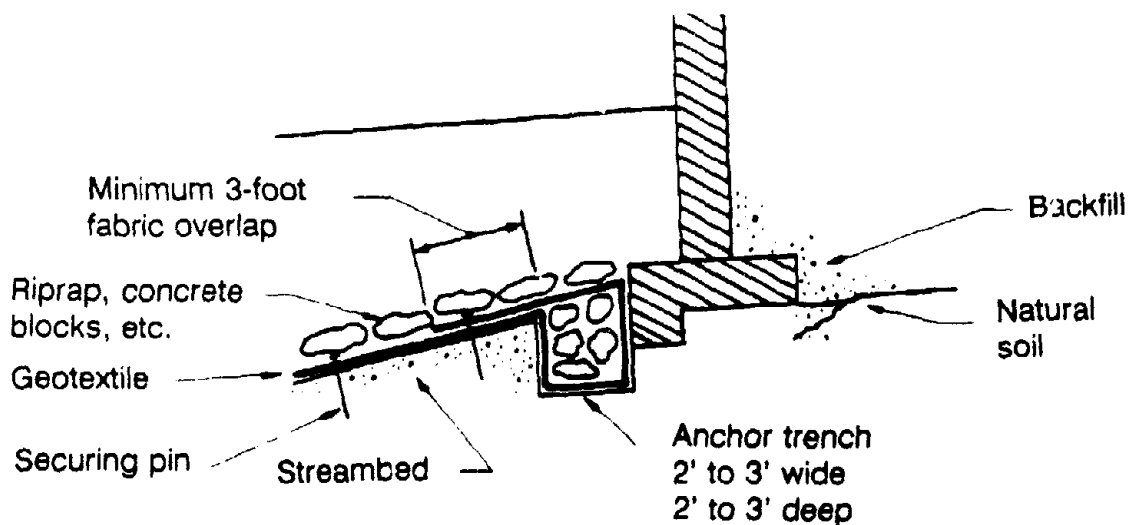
Use of geotextiles to prevent scour. Adapted.⁽³⁾
